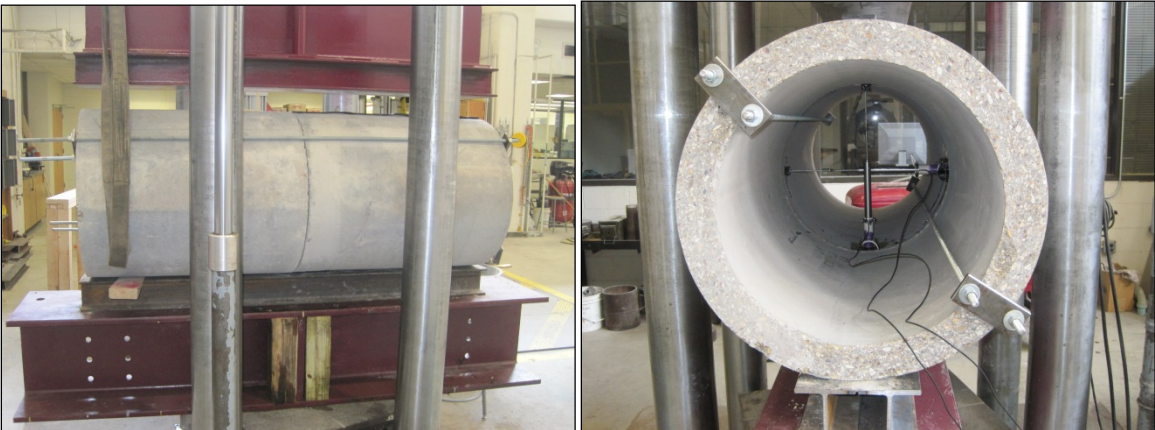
Parallel Plate Loading Test Setup of Jointed Concrete Pipe.
